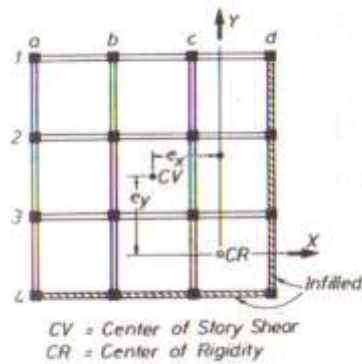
Floorplan of a multistory reinforced concrete frame building with infill of two boundary frames (Paulay 1992)
